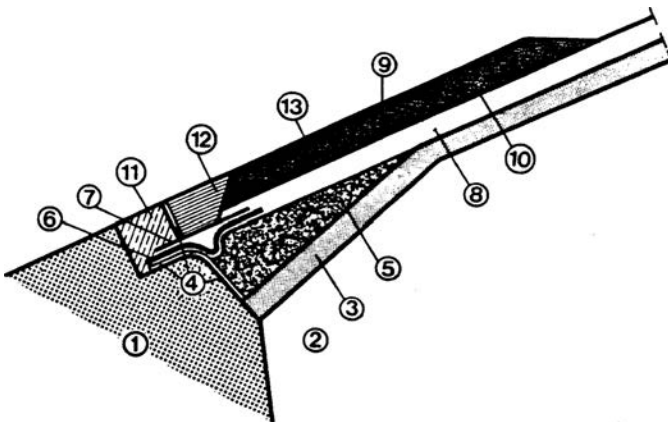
Joint with expansion connection (German Association of Soil Mechanics and Foundation Engineering). (1) Concrete; (2) compacted rockfill; (3) asphalt leveling layer; (4) binding coating; (5) asphaltic concrete wedge; (6) expansion joint; (7) copper cover sheet; (8) watertight asphaltic concrete; (9) geotextile; (10) asphaltic concrete protective layer; (11) cement-concrete; (12) sealing compound; (13) mastic.
